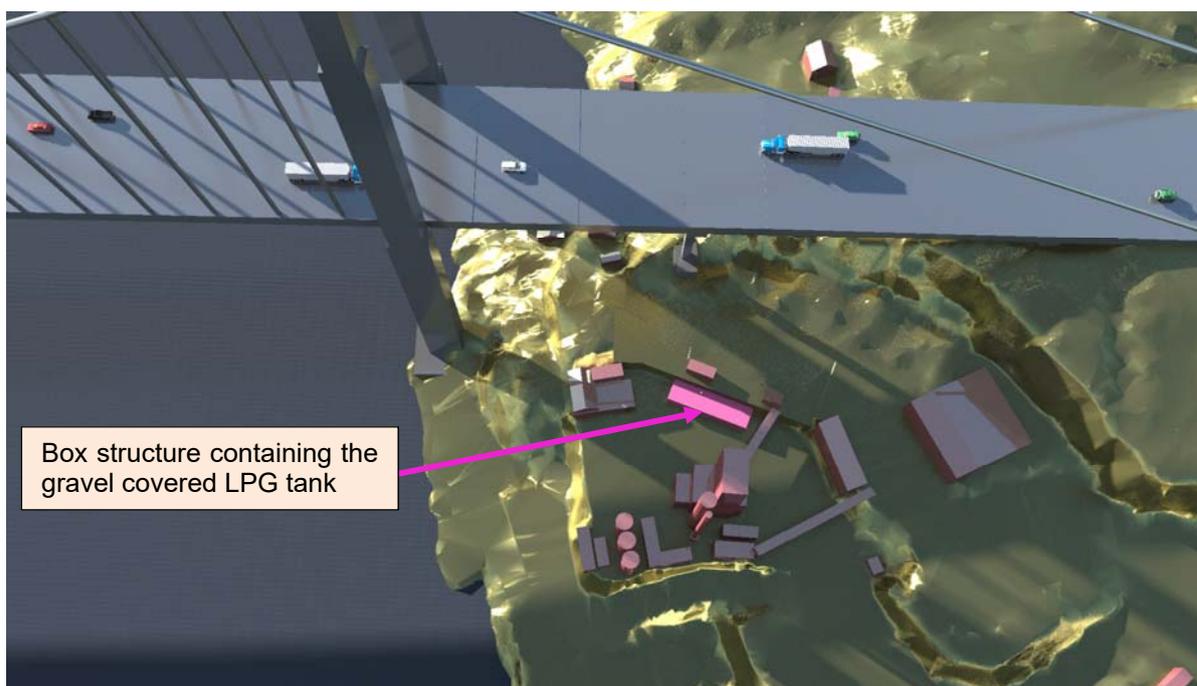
3D model of asphalt plant and the new Sotra bridge
